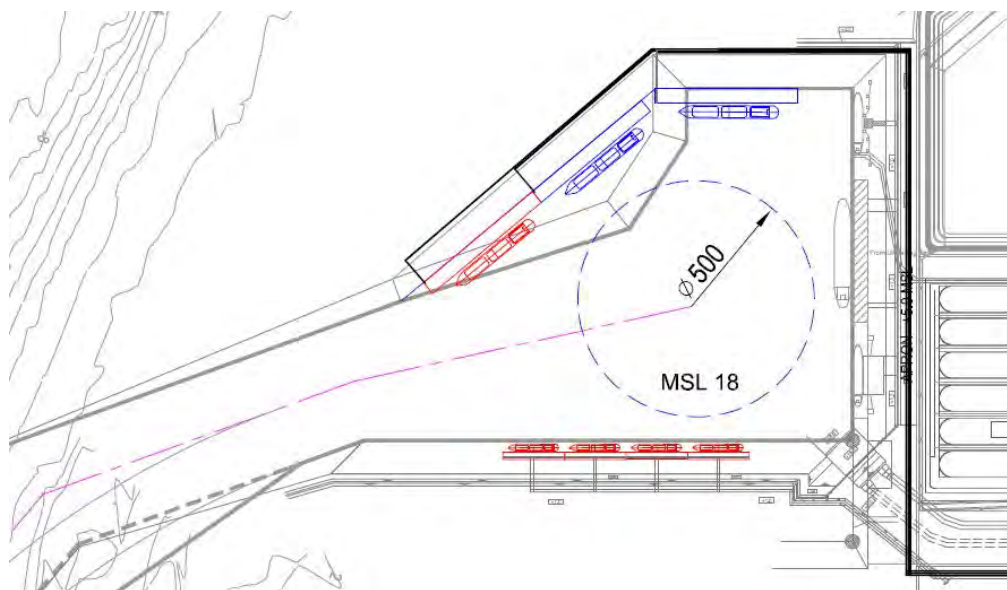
Layout Plan of Coal Unloading Berth in the 2nd Phase
